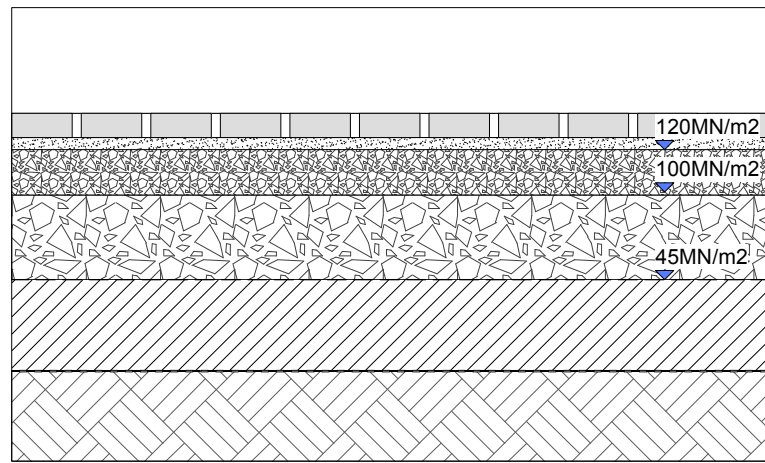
illustrates the cross-section of the composite floor system. The system consists of a top concrete slab, a middle layer of 100MN/m<sup>2</sup> concrete, a layer of 45MN/m<sup>2</sup> concrete, and a bottom layer of concrete with a brick pattern. Arrows indicate the direction of the applied load.
